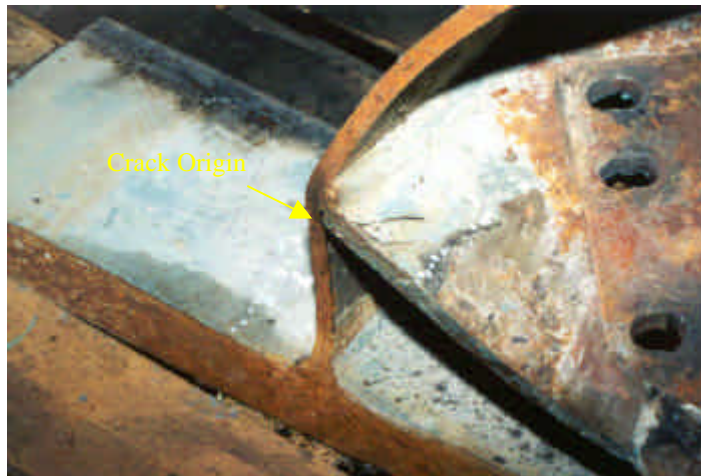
Section of Girder F P.P. 28 Containing the Shelf Plate Weld Fracture Origin
